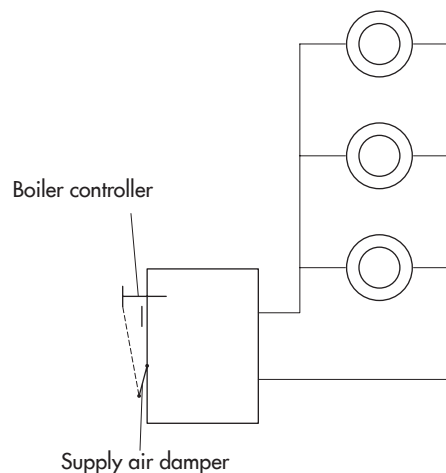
Functional drawing of Type 5 D Boiler Controller
